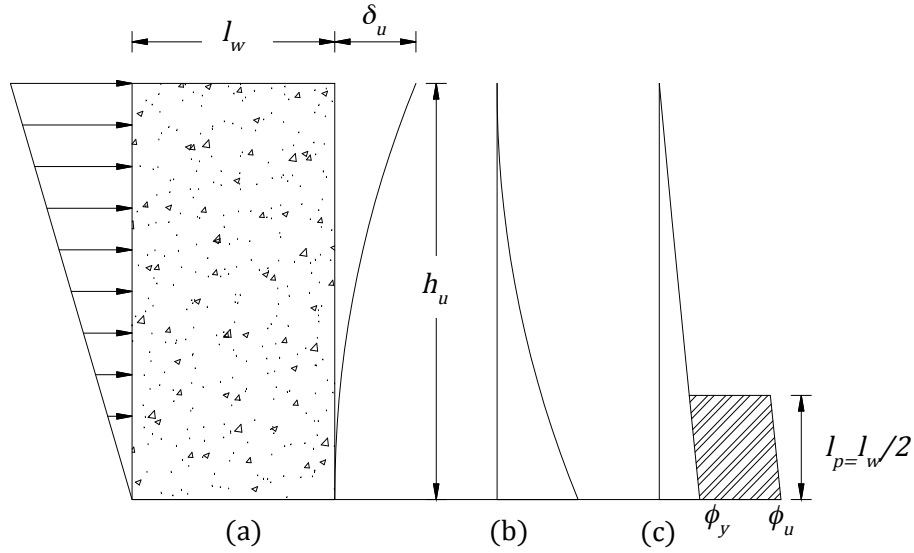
Wall flexural deformations: (a) elevation, loading and drift; (b) moments; (c) curvatures.
